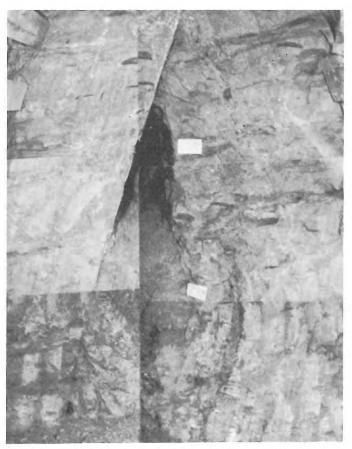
Mosaic showing cavity along Fault I at Station 0+62 in Excavation No. 9. Cavity extends beyond face to distance of 4.5 feet.
